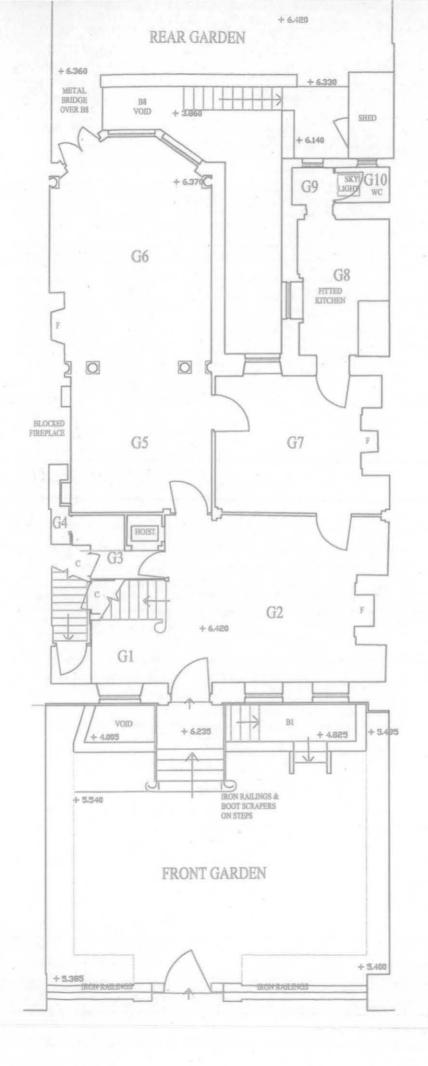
Plan of building at ground level, including front and rear gardens (1:100)
